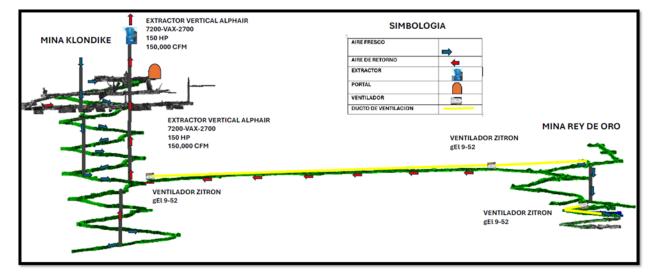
Klondike – Rey de Oro mining area ventilation layout
